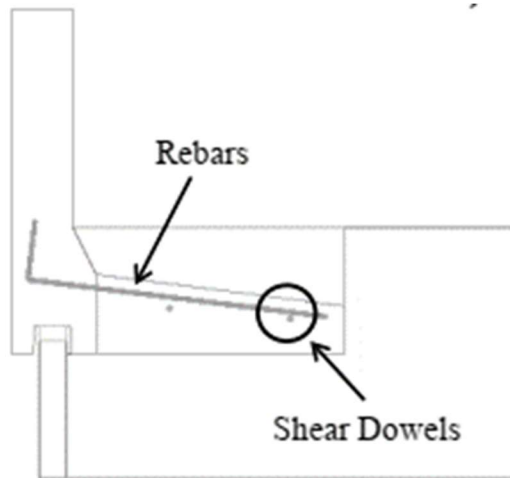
Reinforcement details: anchoring rebar and shear dowels
